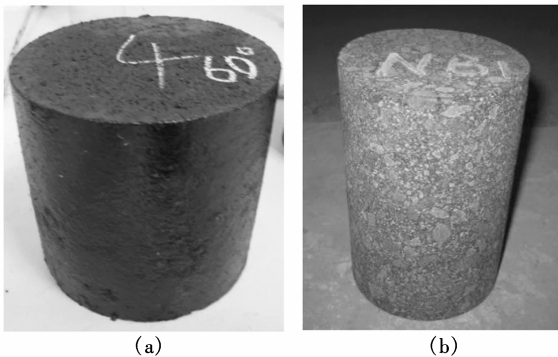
Preparation of the specimen. (a) Cylinder specimen shaped by gyratory compactor; (b) Target specimen after coring and sawing
